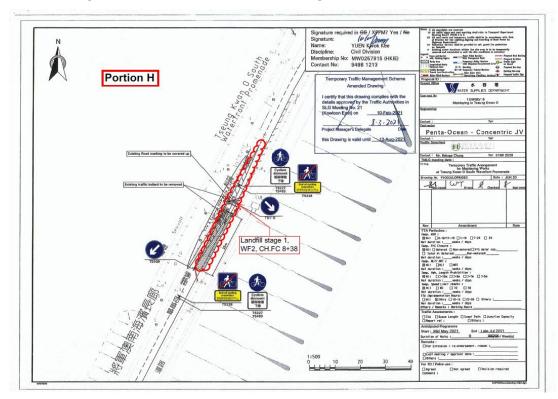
Location Plan – Landfill Stage 1 (Area FC8+38)
